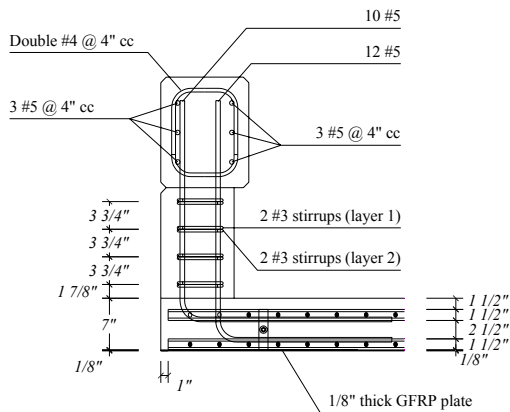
GFRP reinforcement layout at intermediate post and rail/deck connection
